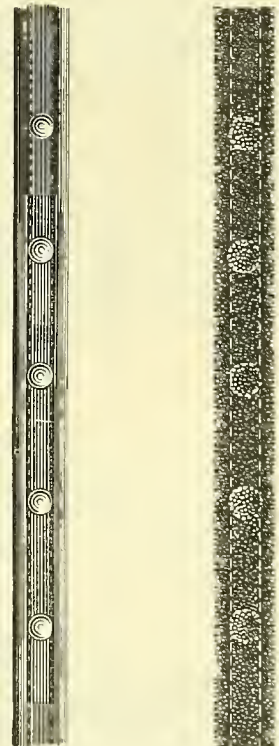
SECTIONAL VIEWS, SHOWING THE USE OF SLAT AND WEBBING AND
